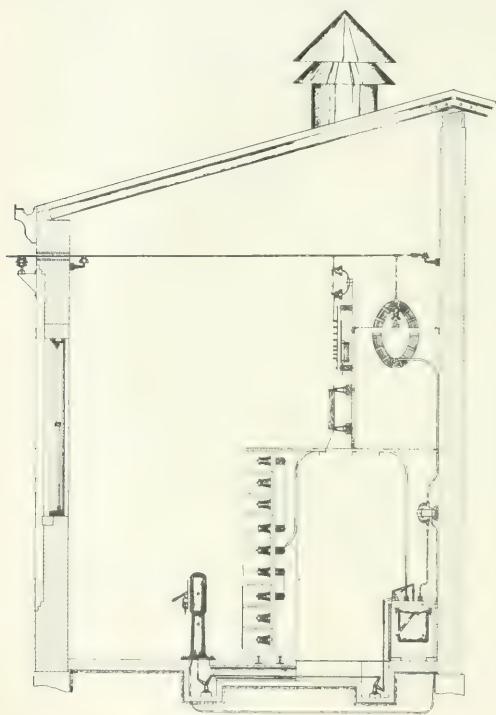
SECTIONAL VIEW OF 13,000 VOLT SWITCHBOARD STRUCTURE AT ESLEN SUB-STATION
